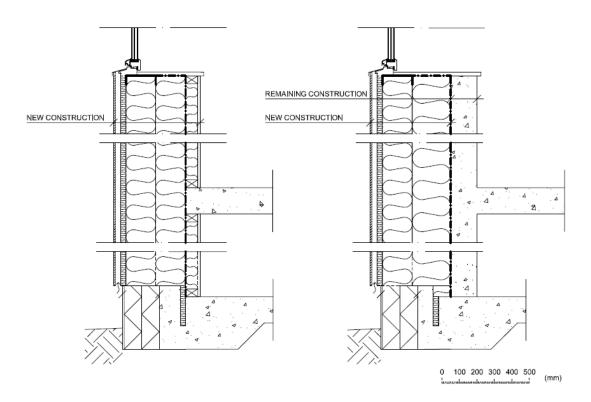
Infill and load bearing wall in the pilot renovation: Additional insulation, full demolition.
